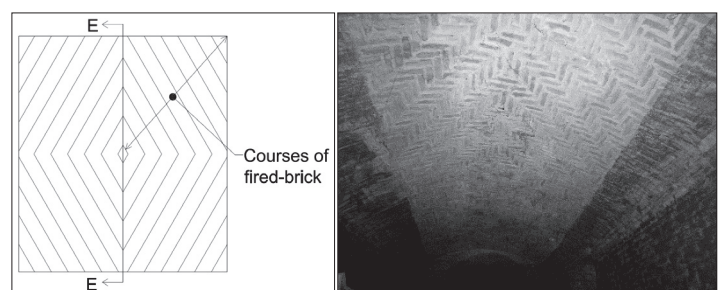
Left figure) *Khandan* pattern, right figure) *Khandan* ceiling - Nabi house (E-E section is shown in Fig. 9) (Drawing and photograph by K. Kawish 2017)
